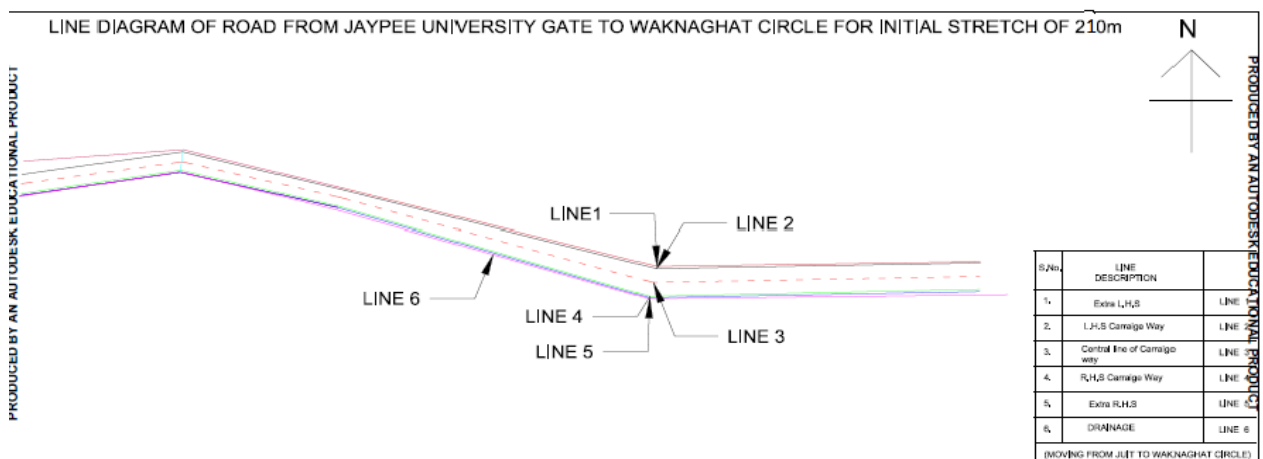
Auto cad drawing for road stretch from Jaypee Gate to 210m stretch
